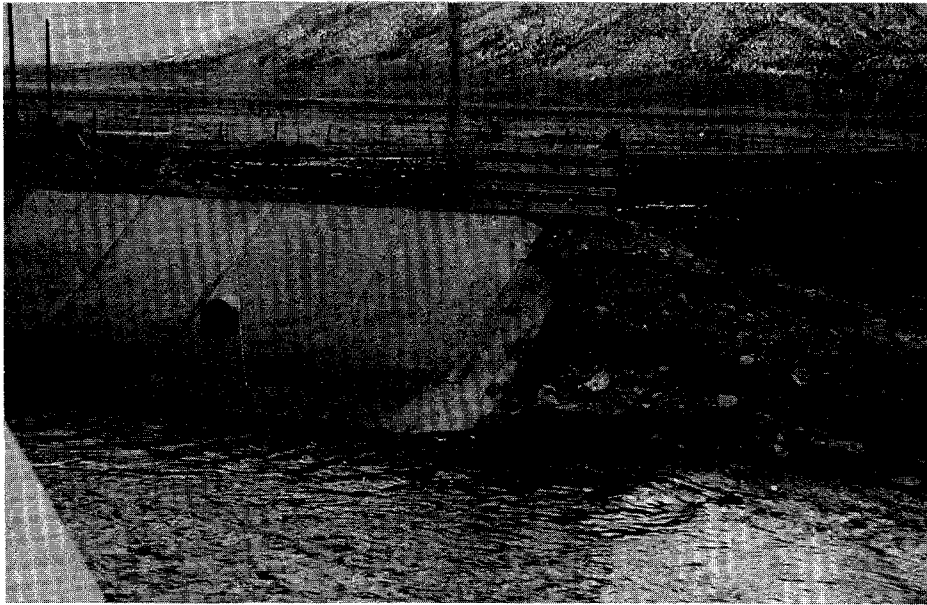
Slope paving left bank at downstream side of bridge on Dec. 27, 1955. Note lateral erosion of bank downstream from end of slope paving. (From Nevada Dept. of Highways.)
